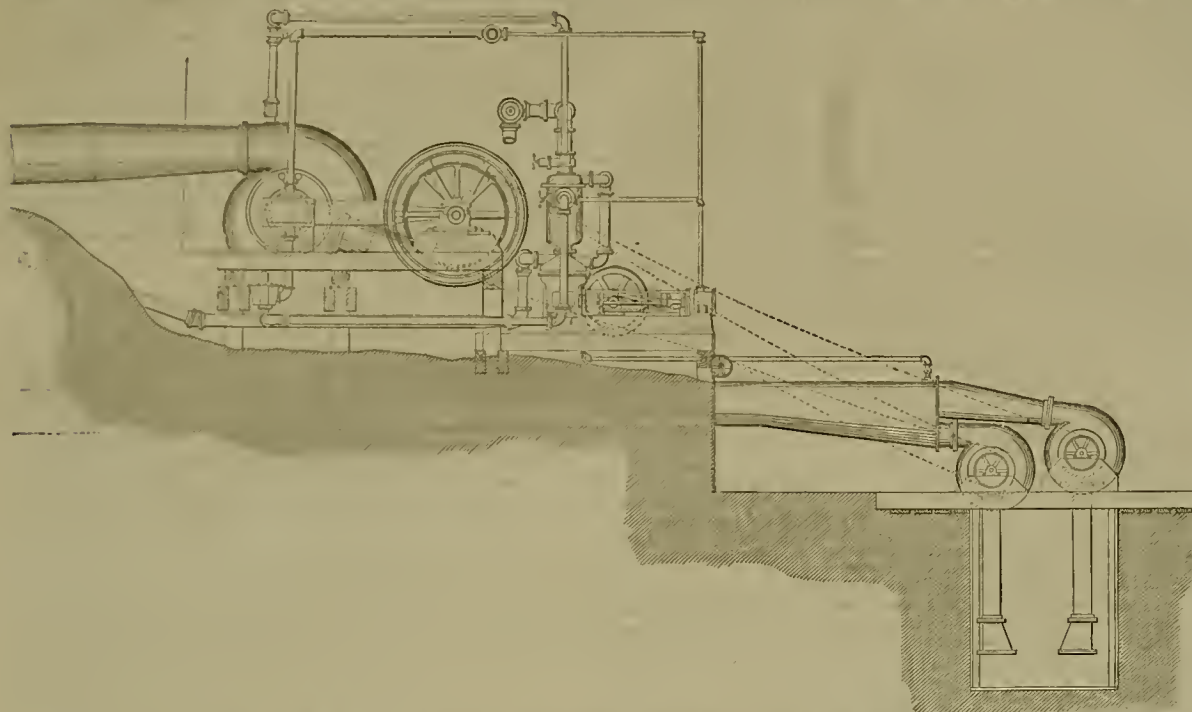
SIDE ELEVATION OF PUMPING PLANT AT A-B ON THE PLAN.
